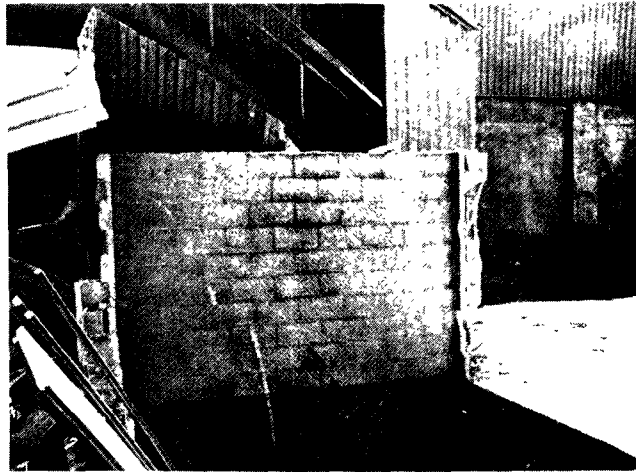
REMAINDER OF REAR WALL OF CONVEYOR BUILDING NEAREST TO SHREDDER PLANT (Reference 12)
